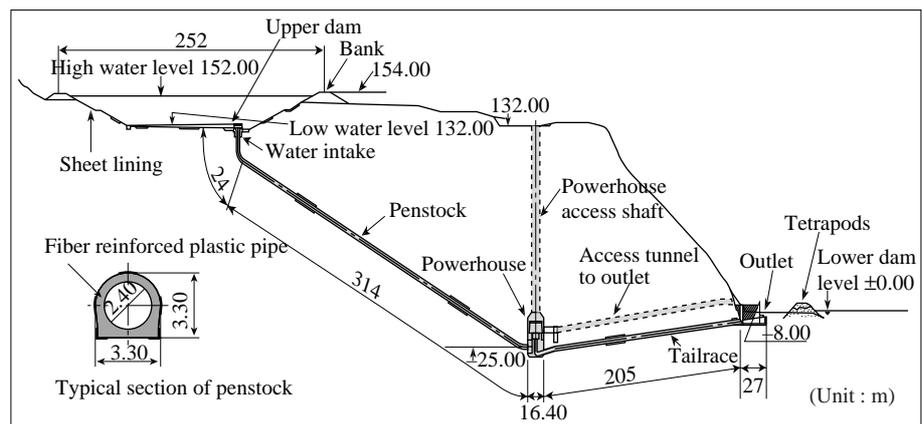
Sectional View of Waterways. The underground powerhouse is situated 150 m below ground level.
